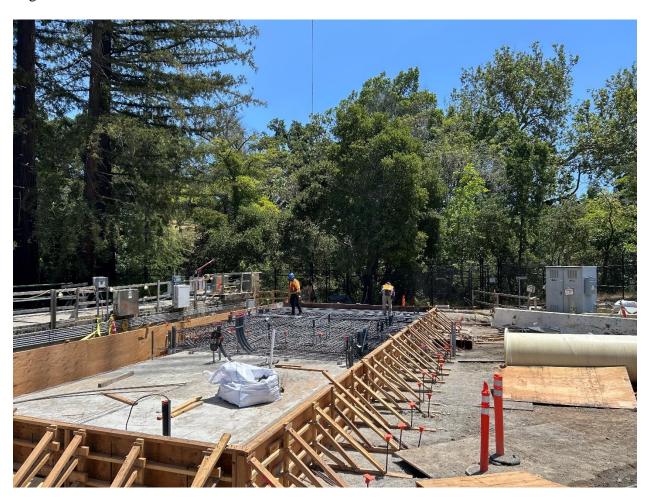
Ironworkers installing rebar for the future Los Altos Power Building foundation which is located on top of the former Los Altos Pumping Plant No. 1 (LAPP1). All remnants of the intricate underground piping installed in the former LAPP1 are backfilled below the foundation in the photo.
